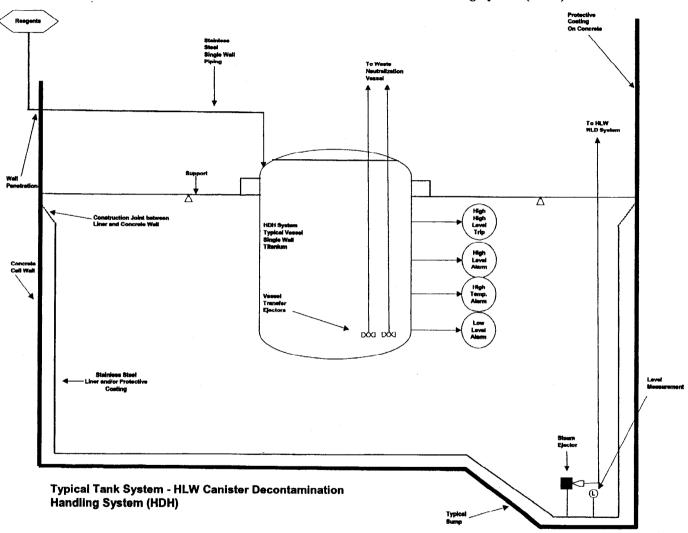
A-56 Typical Tank System – HLW Canister Decontamination Handling System (HDH)
